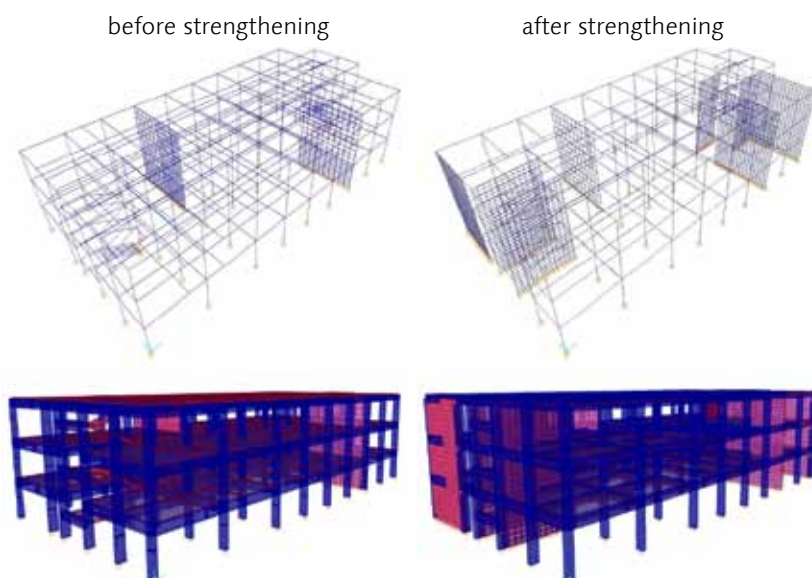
3D model before and after strengthening (Using shell elements for the modeling of the structural walls)
